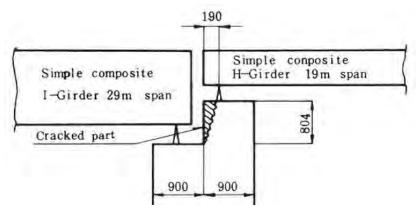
Damaged position of concrete pier
